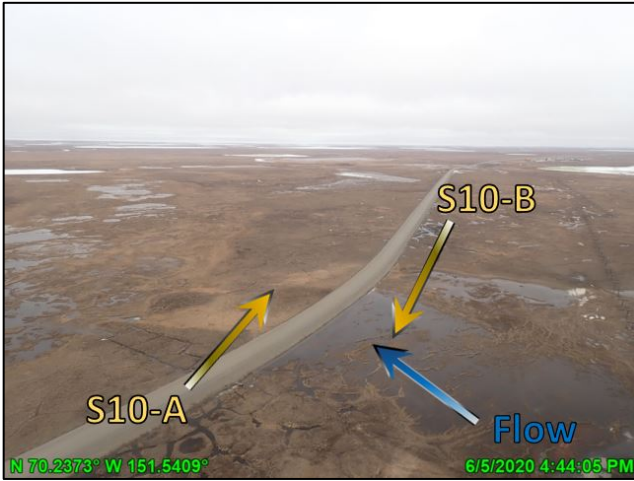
Impounding behind blocked culvert MT7-64, looking northeast; June 5, 2020
